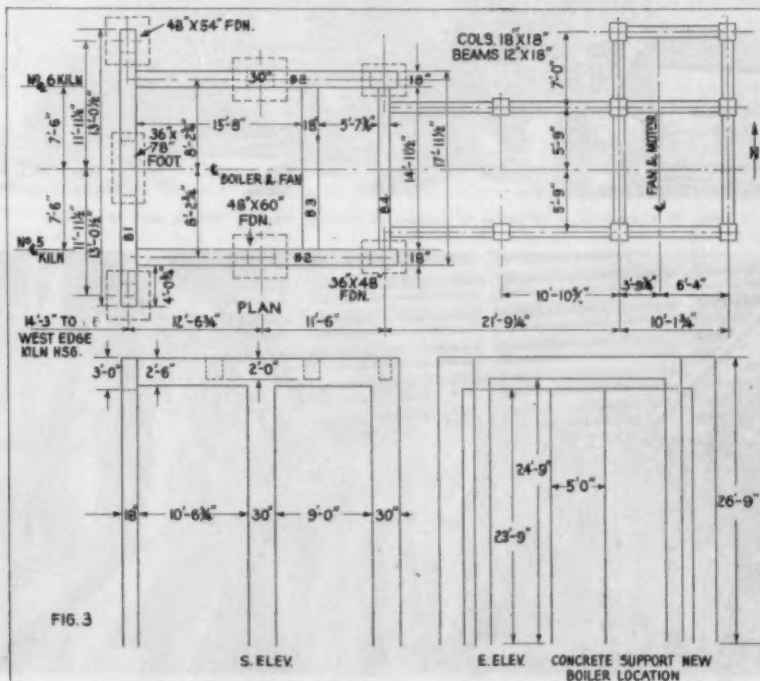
Plan and elevation drawing for concrete foundation to support boiler
